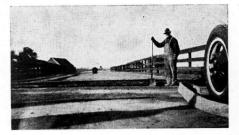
Settlement of a Concrete Pavement Slab Next to a Bridge
